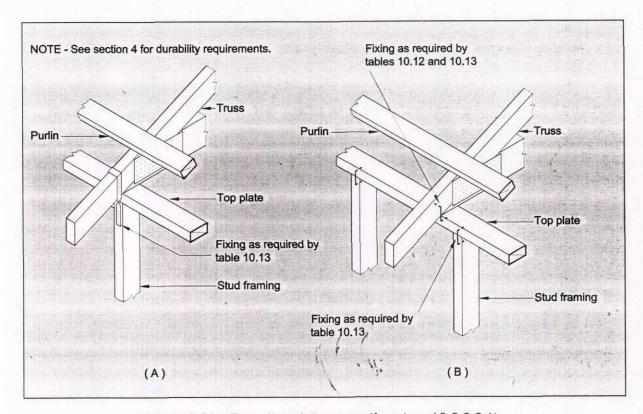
Truss/top plate connections (see 10.2.2.6.1)
